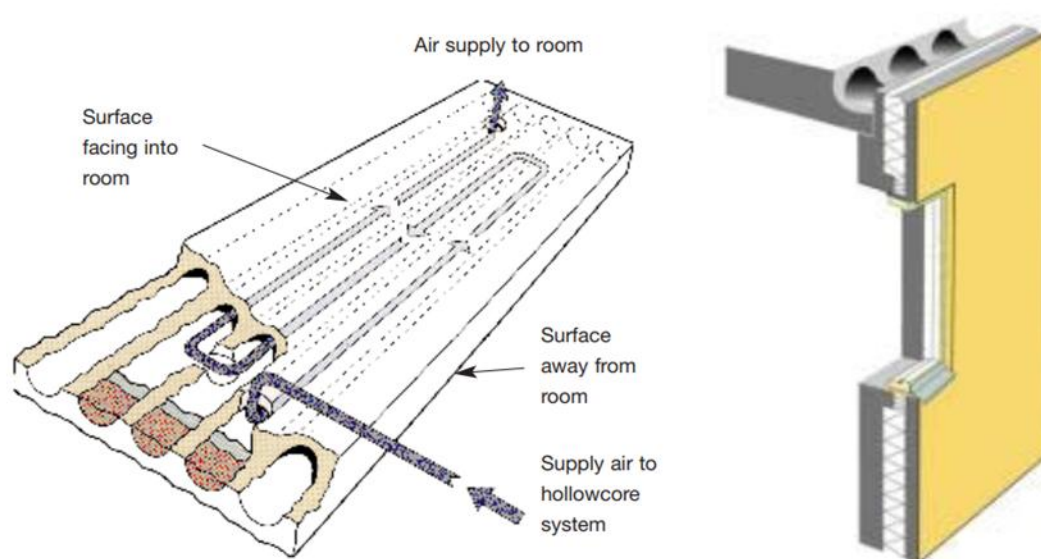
The TermoDeck System: A ventilated hollow core concrete slab (left) and Connection between the slab and external wall (right). Source: TermoDeck
